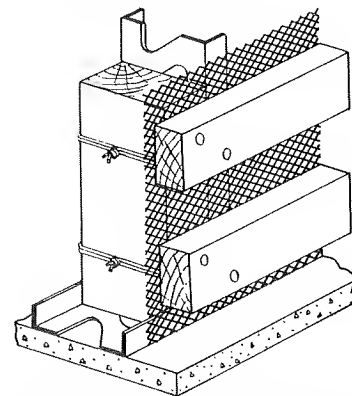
Typical Arrangement of Wood Blocking and Strip Grounds for Metal Stud Hollow Partitions.
